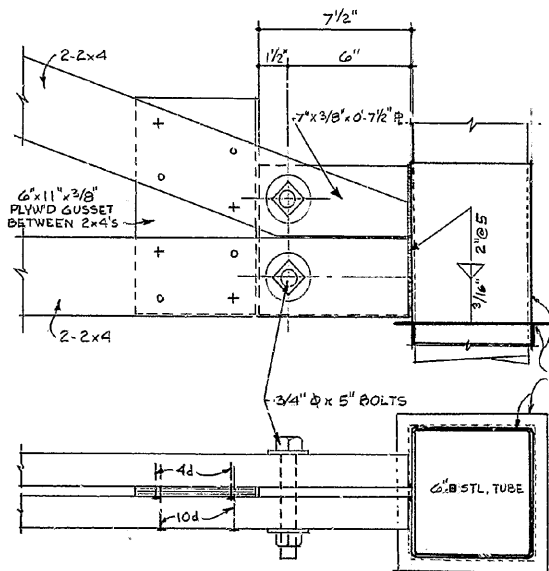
DETAIL "M" - CONNECTION TOP CHORD CORNER TRUSS TO STL. TUBE
